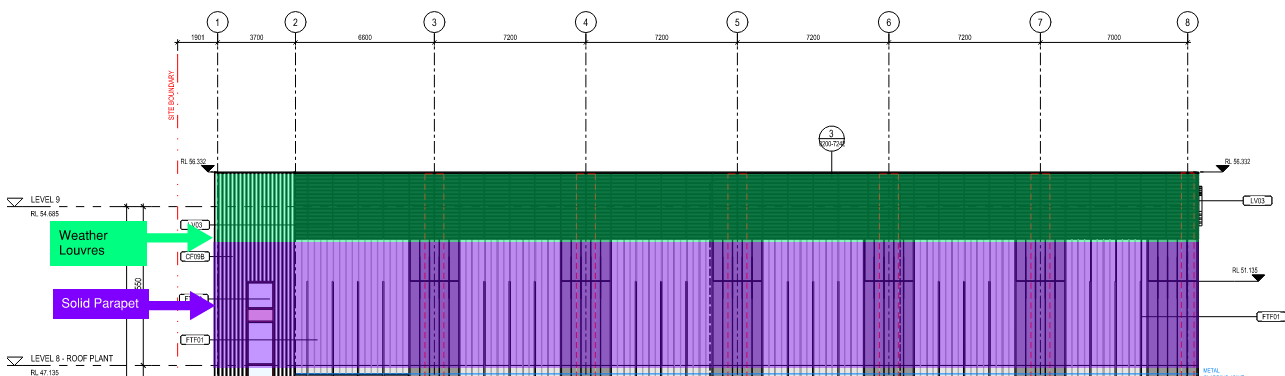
Rooftop acoustic barrier / screen south elevation (Solid up to +6 m From Level 8 FFL) – no change from existing
